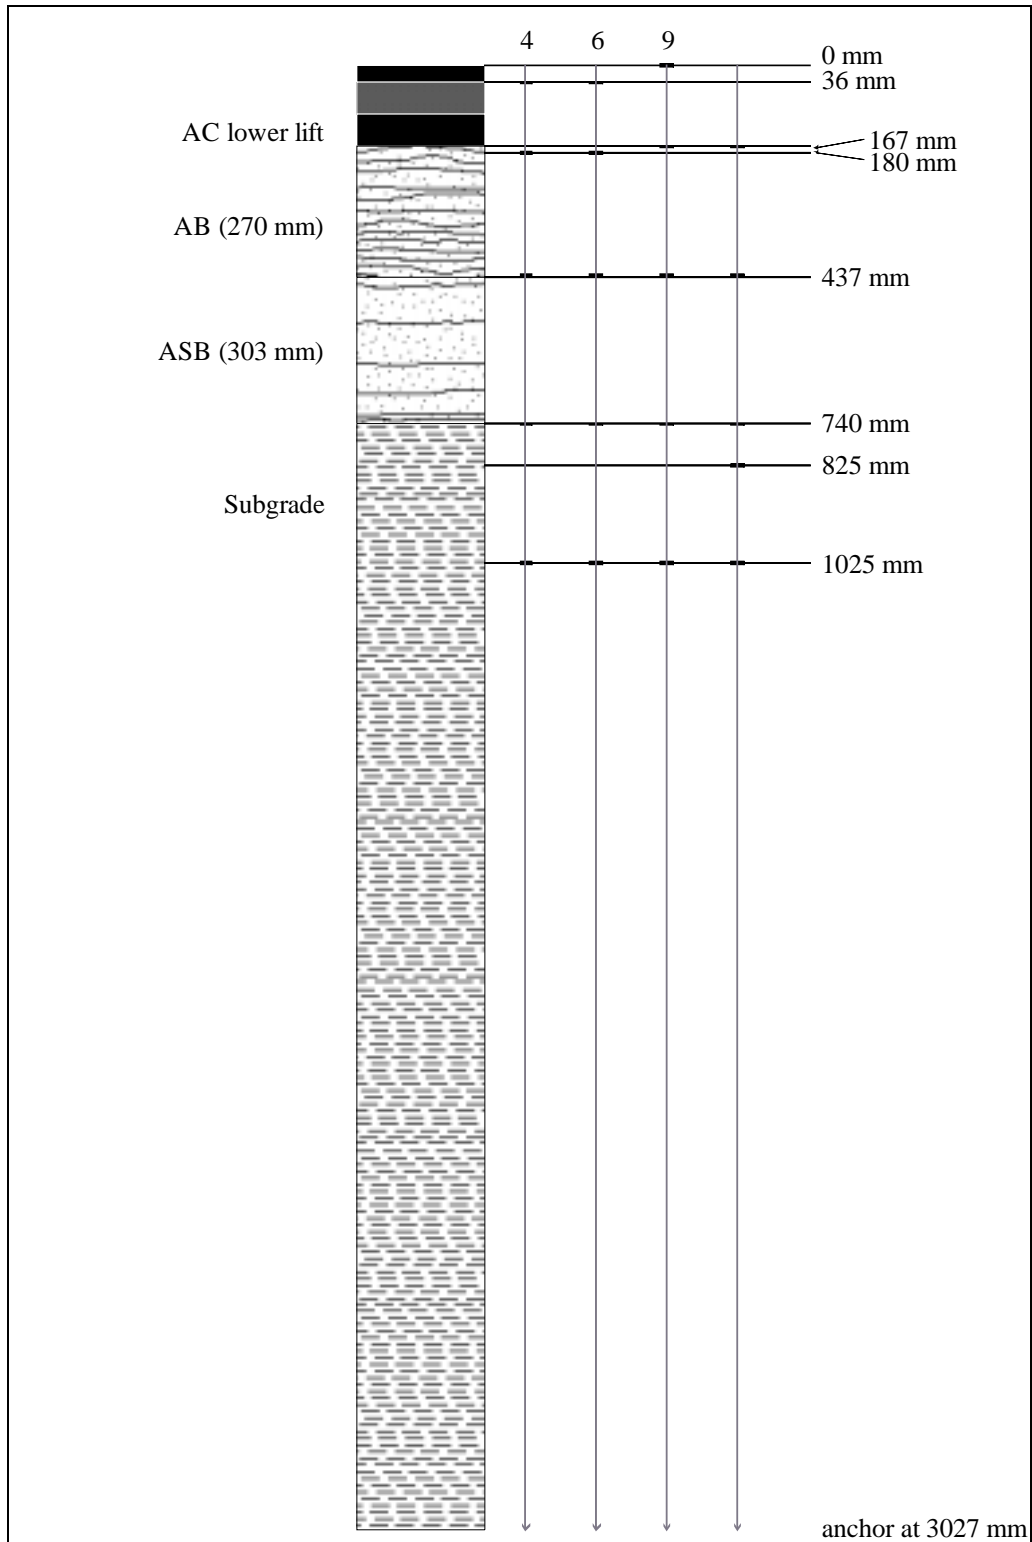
Installation depths for MDDs in Section 518 (undrained, ARHM-GG overlay).
